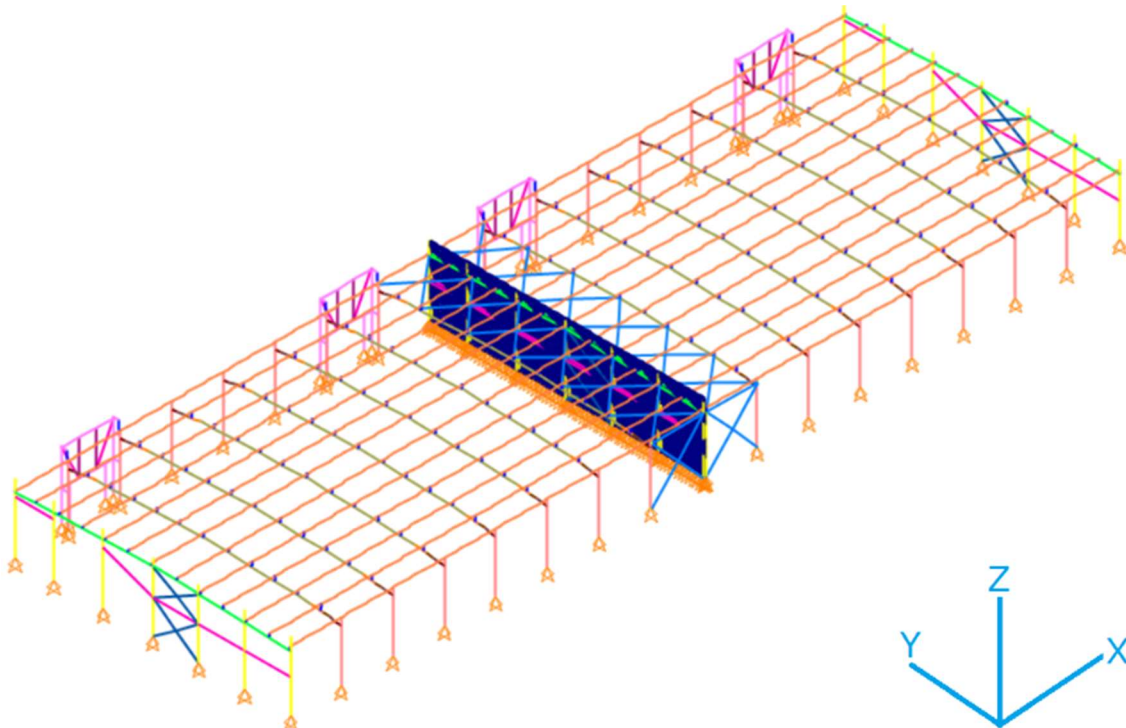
Fire wall parallel to portal frames with bracing system close to it
